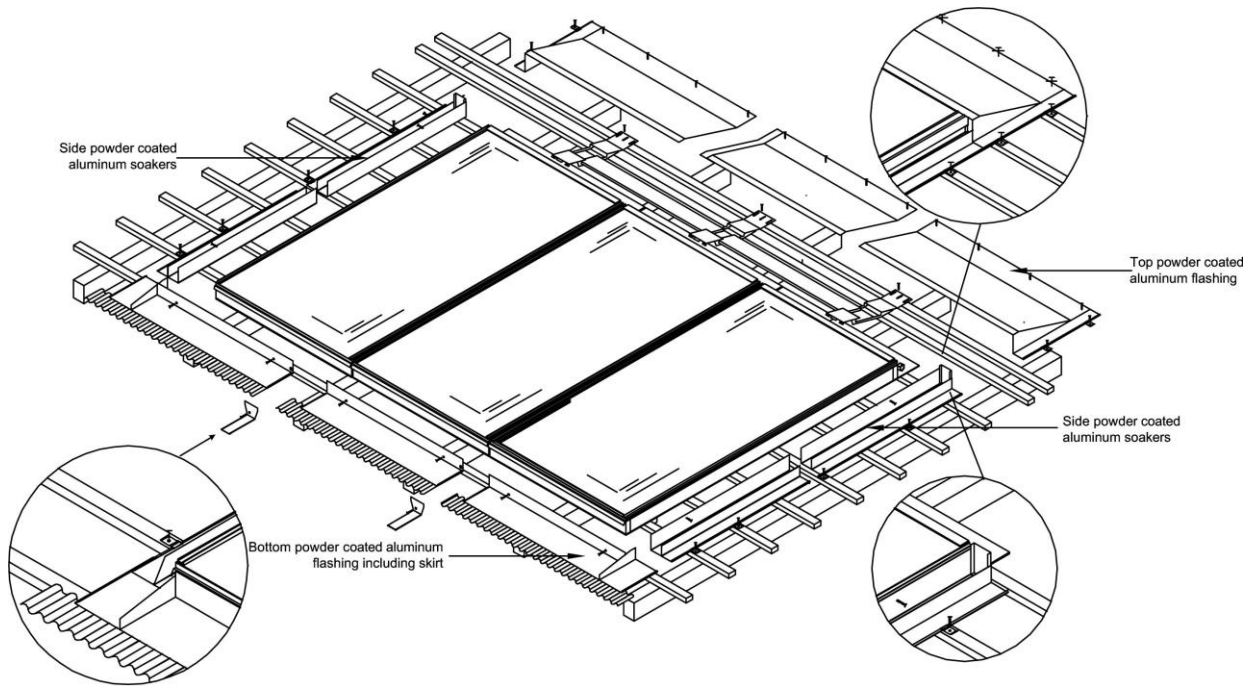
Joule VisSolis Collector - Tile Flashing Detail
